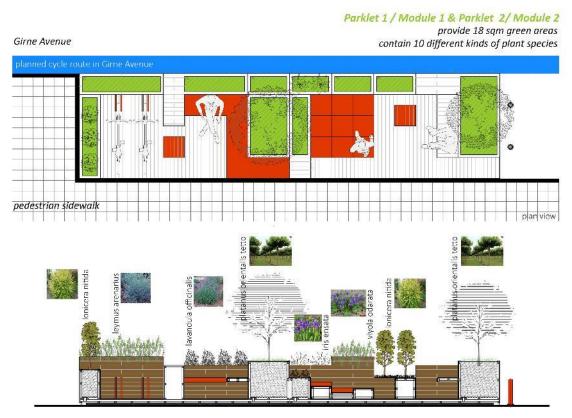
Technical Drawing of Parklet modules #1 & #2
